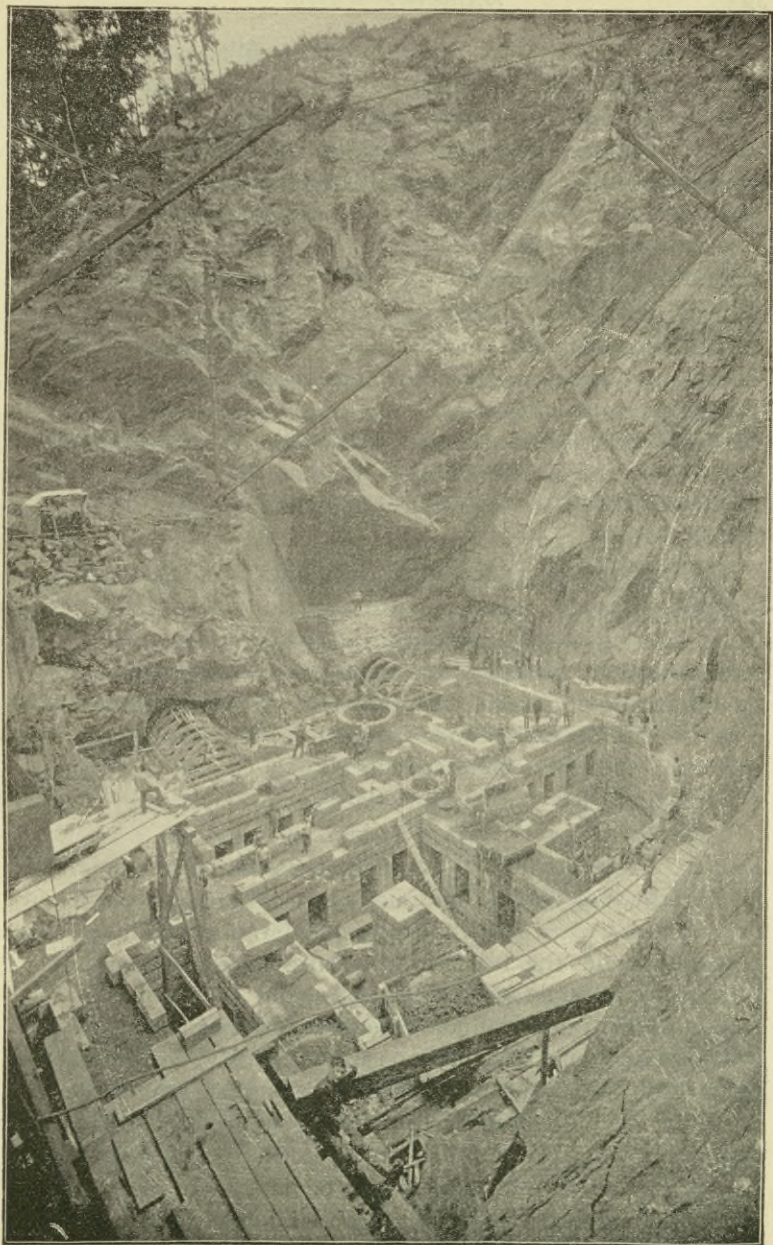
PLATE XXXI.—EXCAVATING FOUNDATION FOR NEW CROTON DAM AND GATE-HOUSE.
